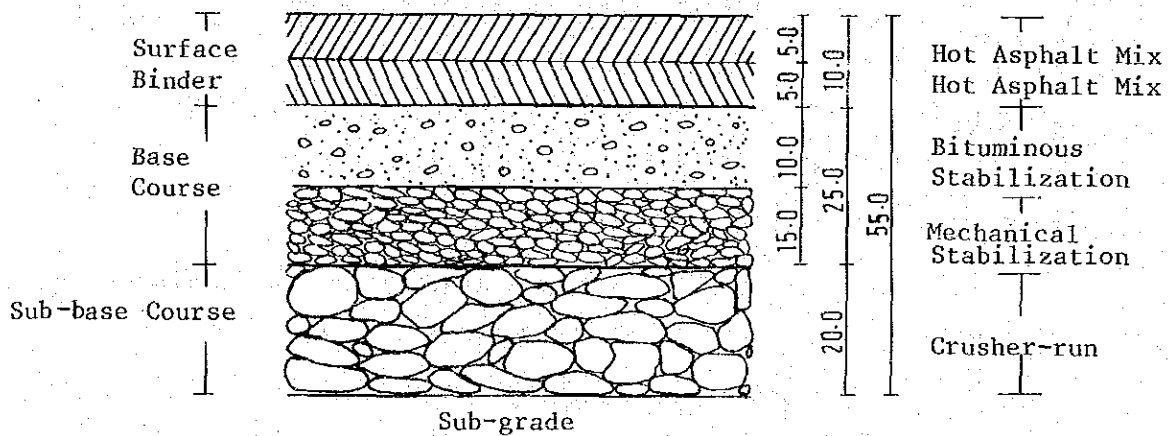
CROSS-SECTION OF PAVEMENT
